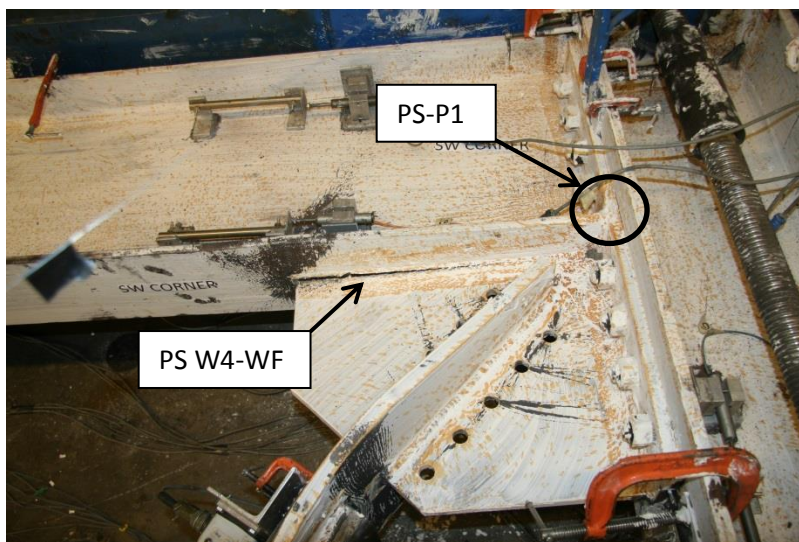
Weld Fracture of SE Beam-to-Gusset Plate Weld (PS W4-WF, 3.9%)
